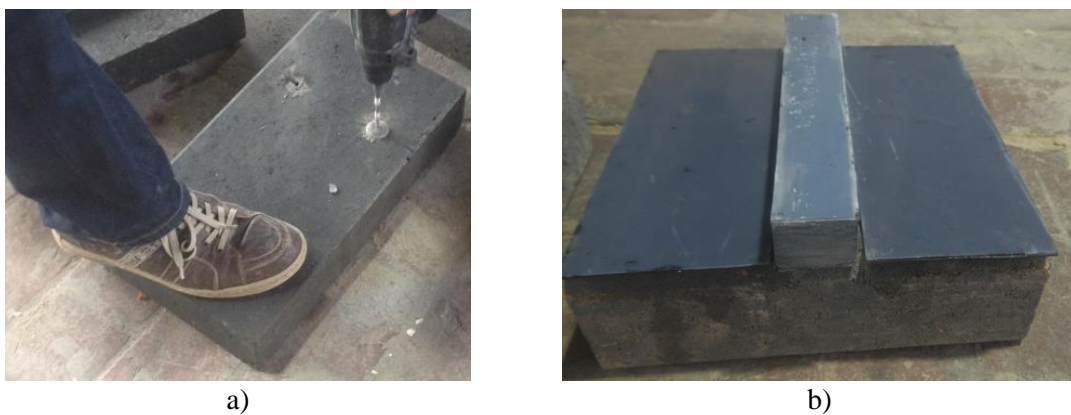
a) Preparation of the concrete plate used for testing beam connection and b) plastic profile attached to concrete plate used for testing column connection
